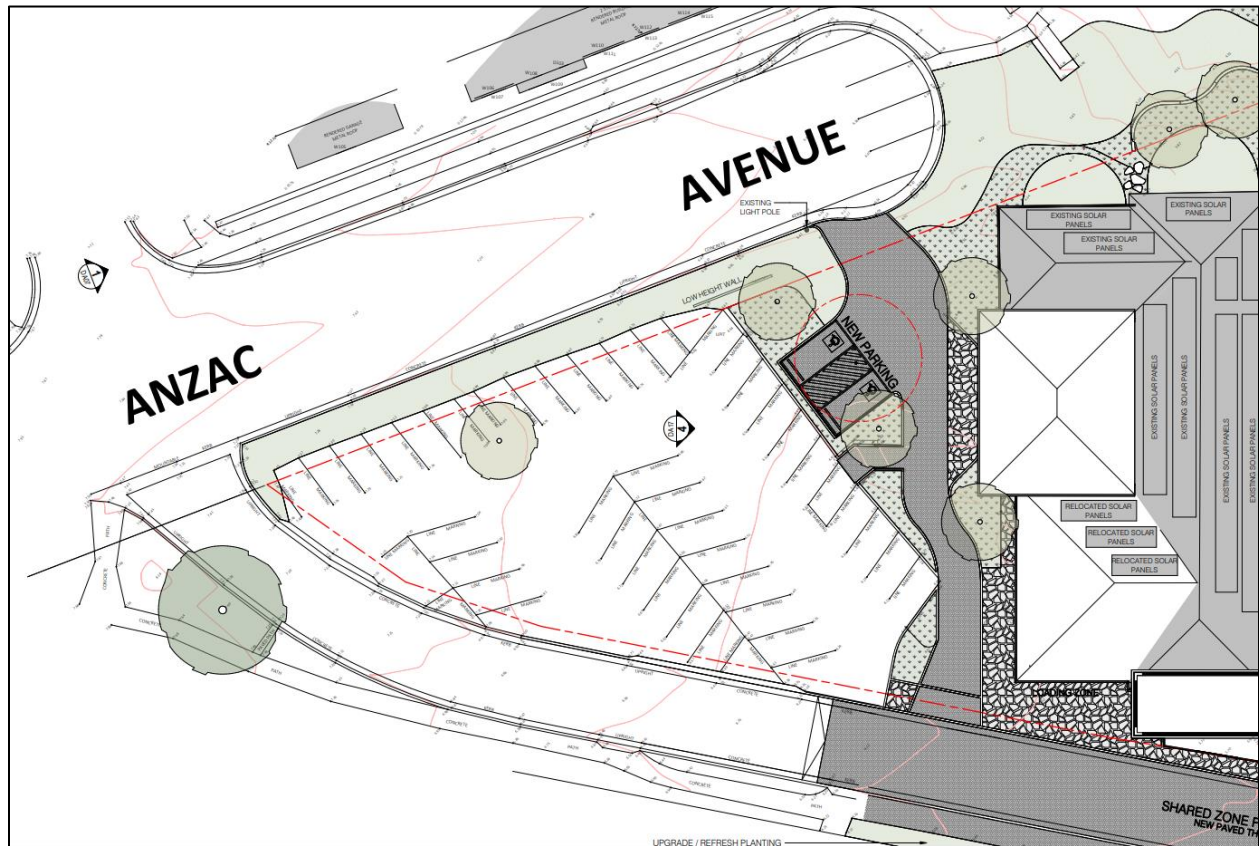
Site Plan Car Parking Layout (Source: i2C, 2025)
